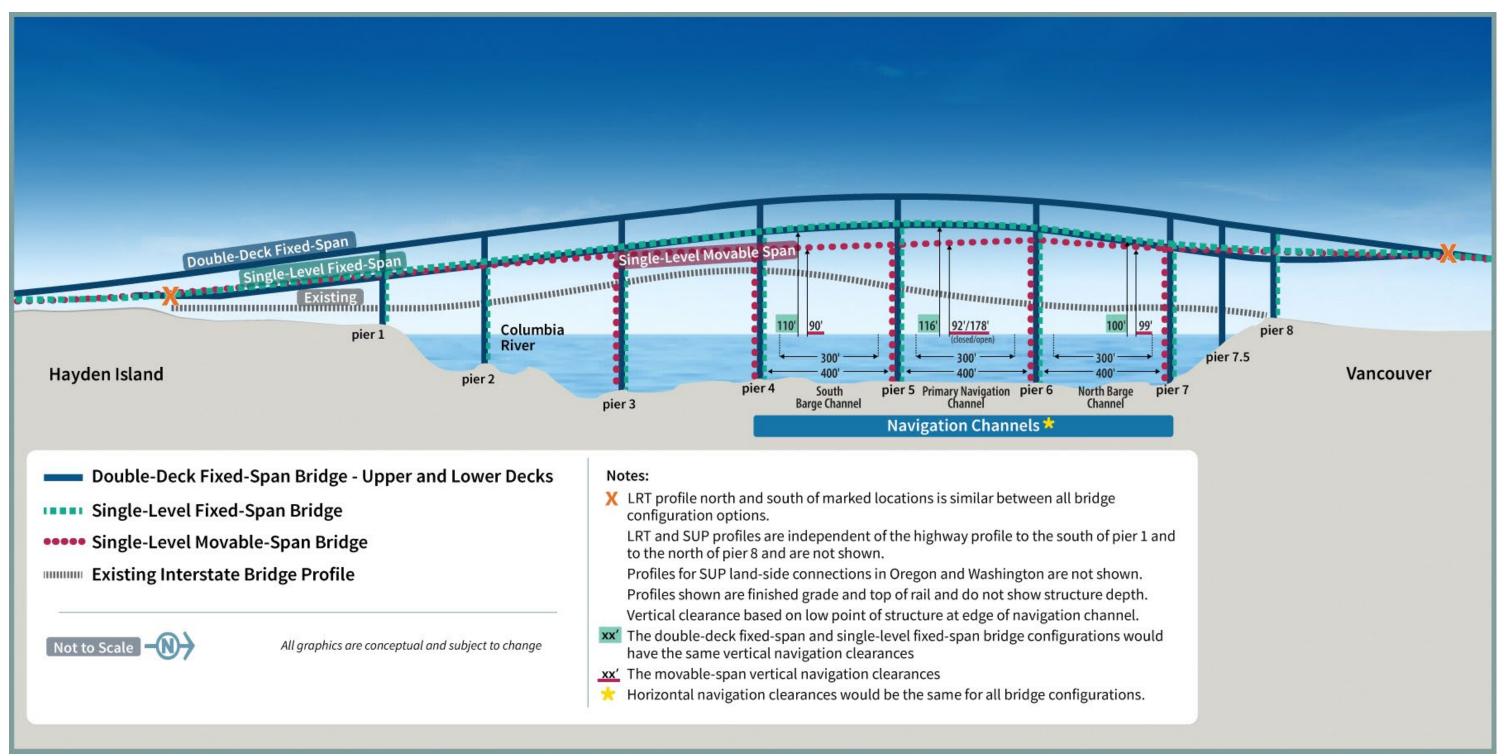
compares the basic profile of each configuration. The lower deck of the double-deck fixed-span and the single-level fixed-span configuration would have similar profiles. The single-level movable-span configuration would have a lower profile than the fixed-span configurations when the span is in the closed position.
